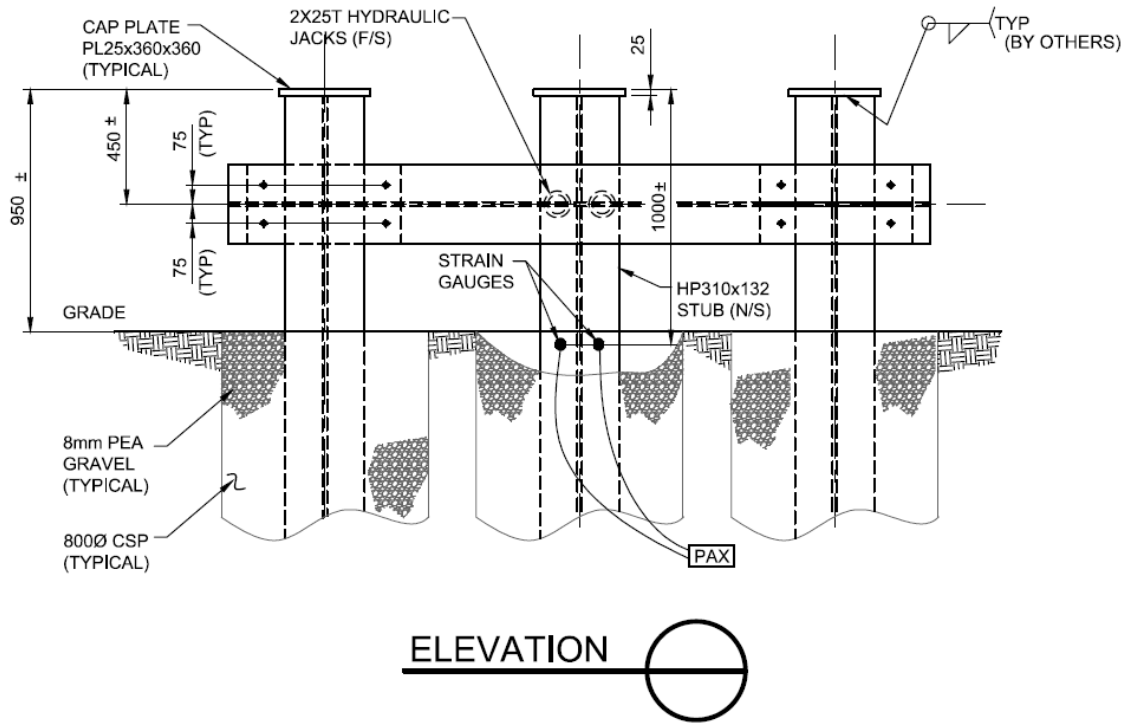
Elevation View of Test Configuration for Static Push Test of Pile P5N.
